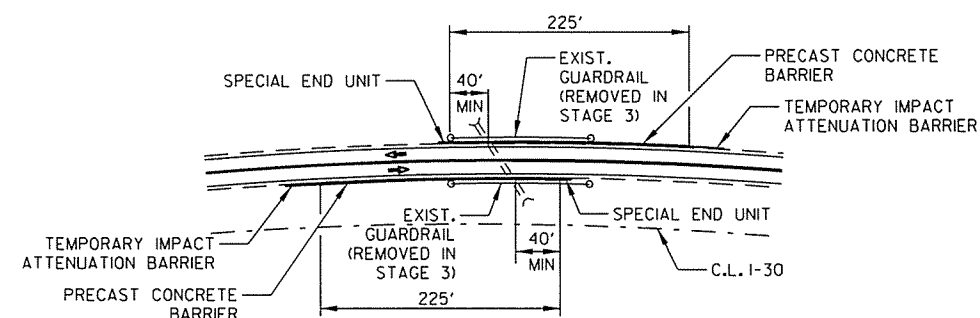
DETAIL OF PIER PROTECTION AT OVERPASSES FOR MAINTENANCE OF TRAFFIC - LEFT MAIN LANES (STAGE 3)
